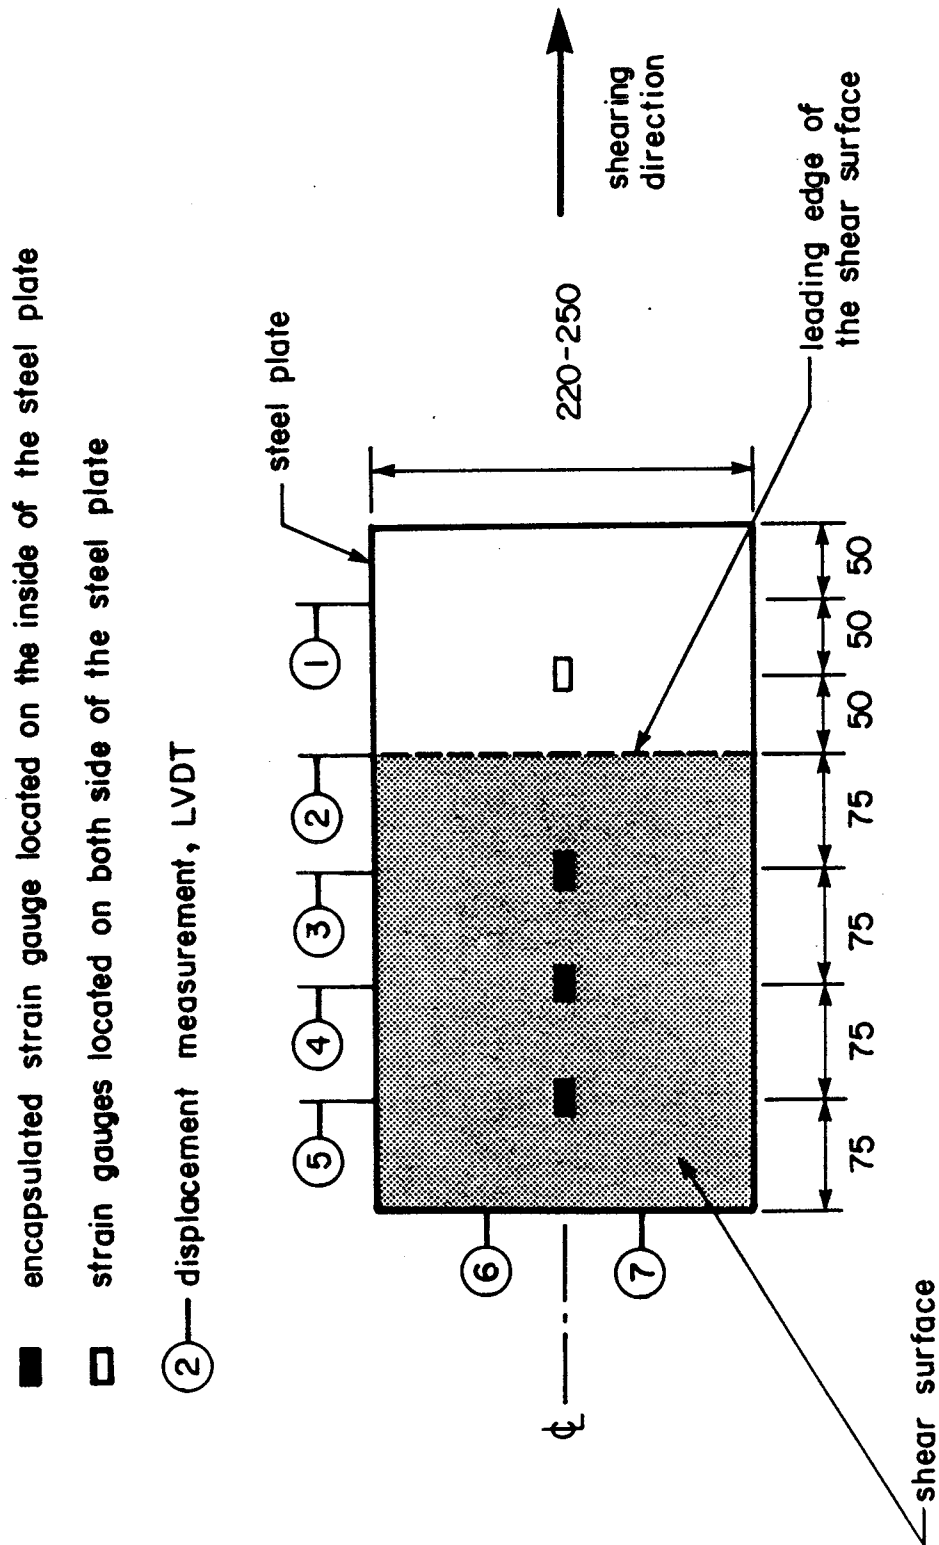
INSTRUMENTATION DIAGRAM - STEEL CONCRETE INTERFACE TEST
